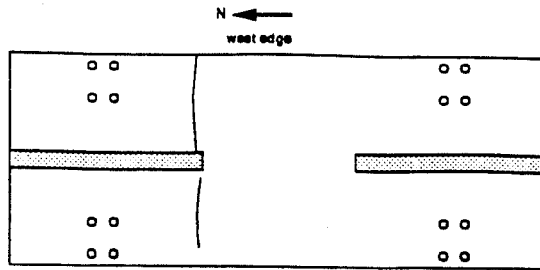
Sp. 2a: Progression of Cracking of Bottom Face of Roof Slab at Load Point 135
